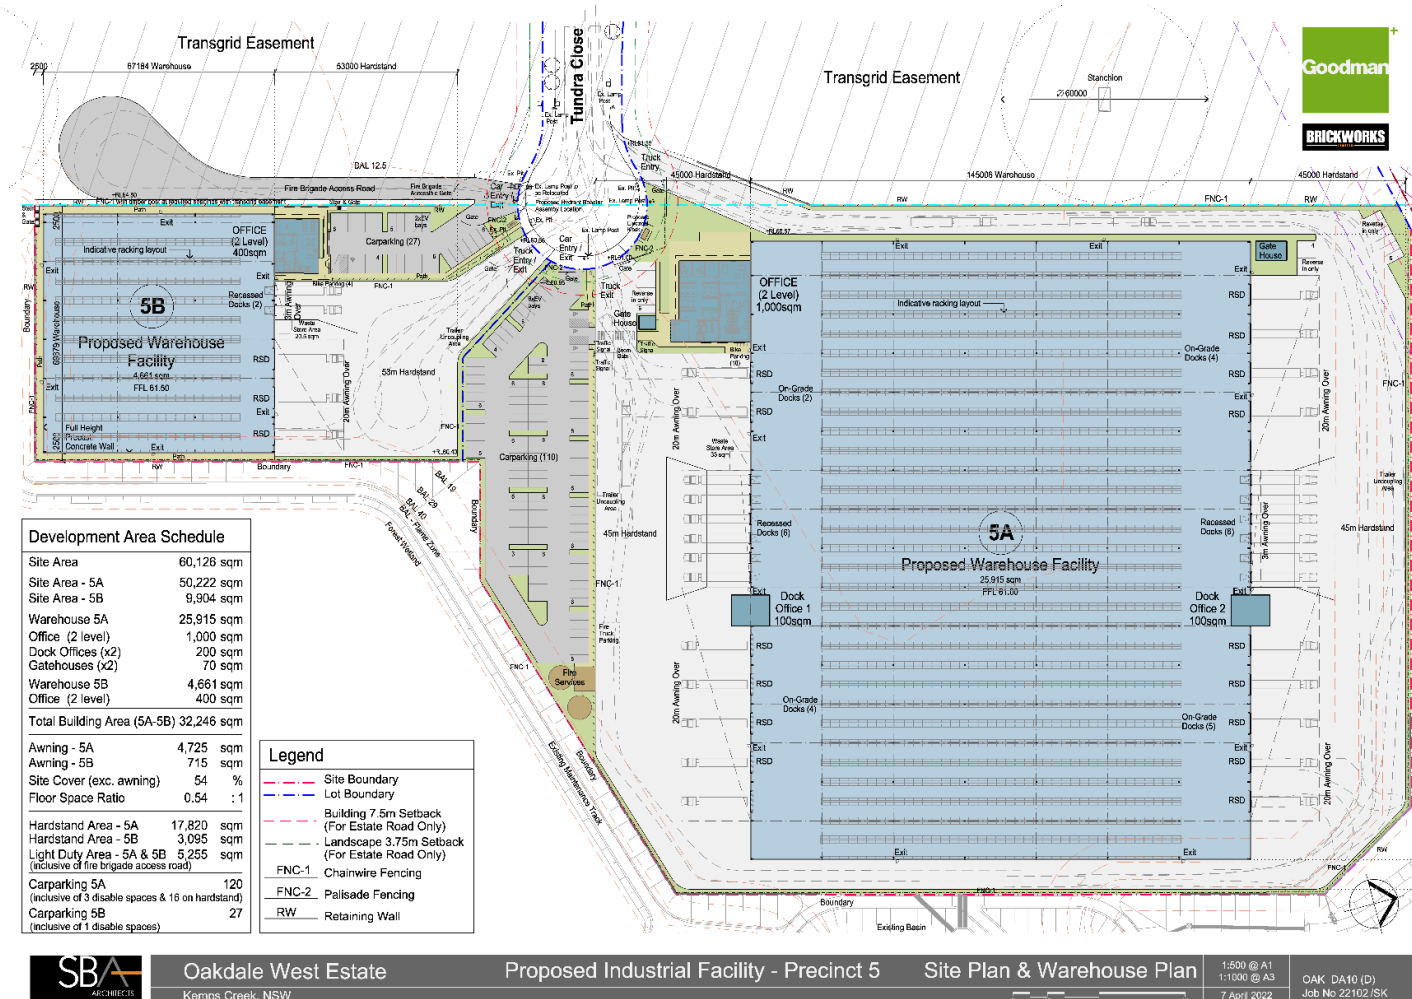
Indicative layout of Buildings 5A and 5B (Source: SBA)
